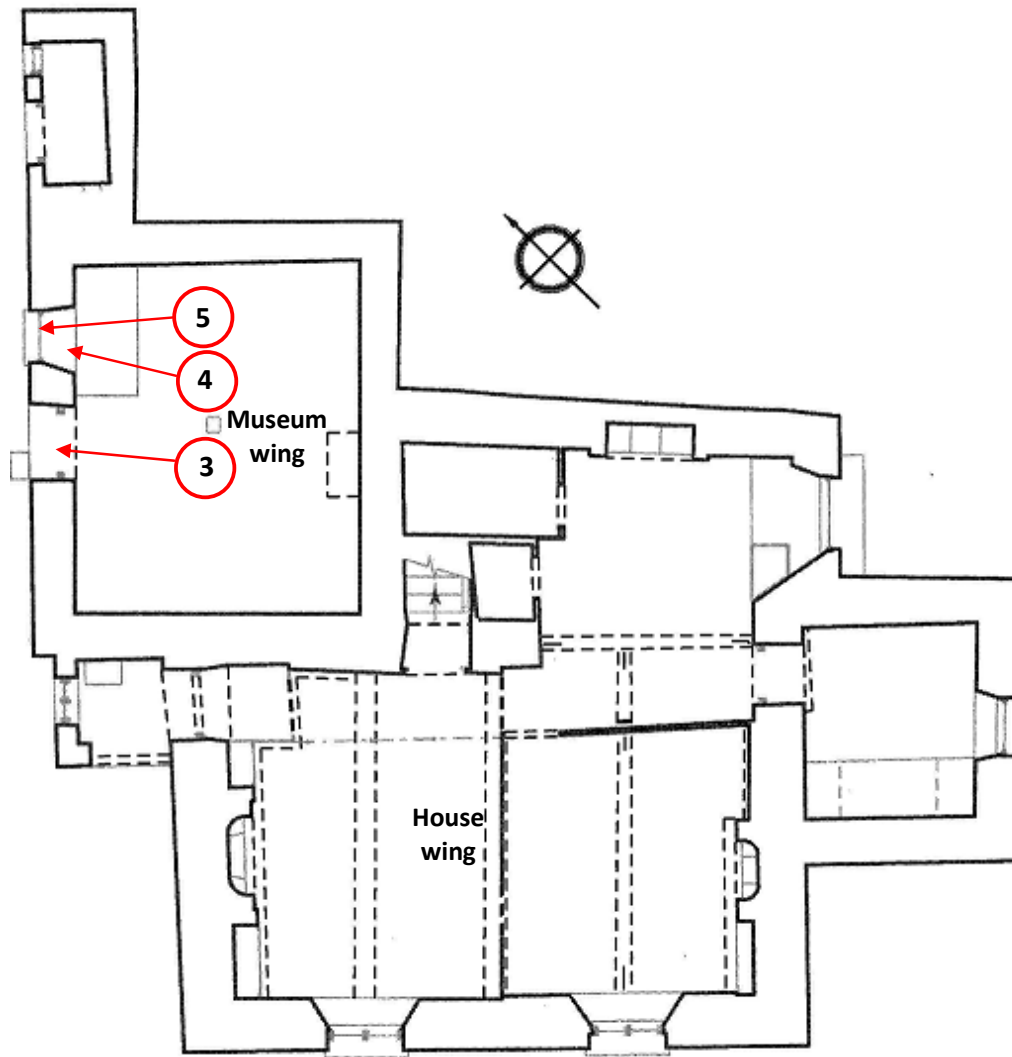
Plan at ground-floor level showing approximate positions of sampled timbers (after Adam Menuge)
